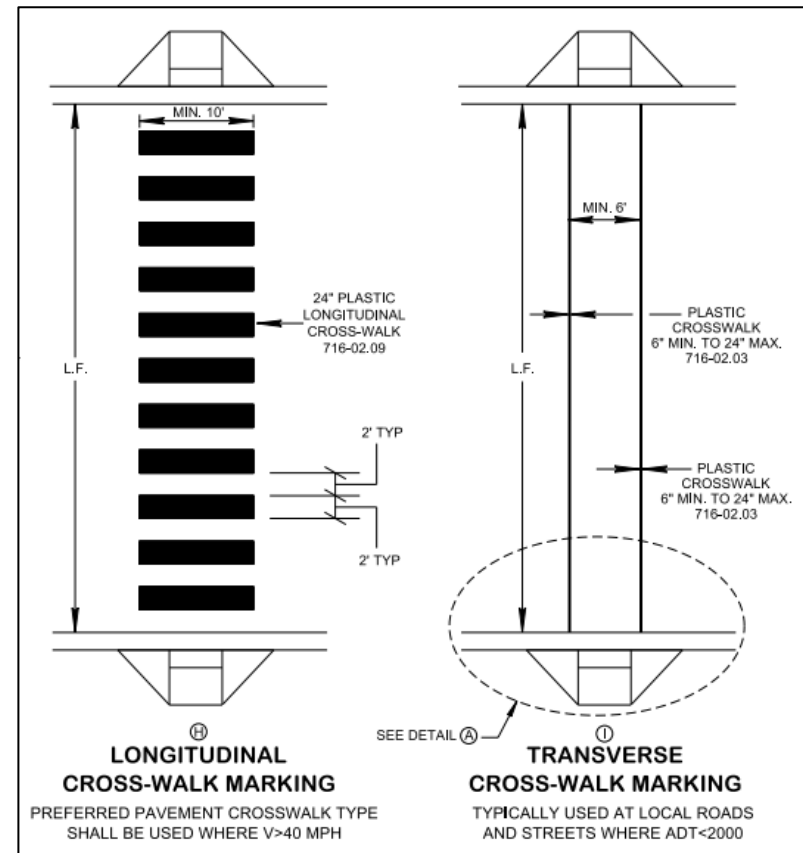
TDOT Standard Drawing T-M-4: Standard Intersection Pavement Markings
